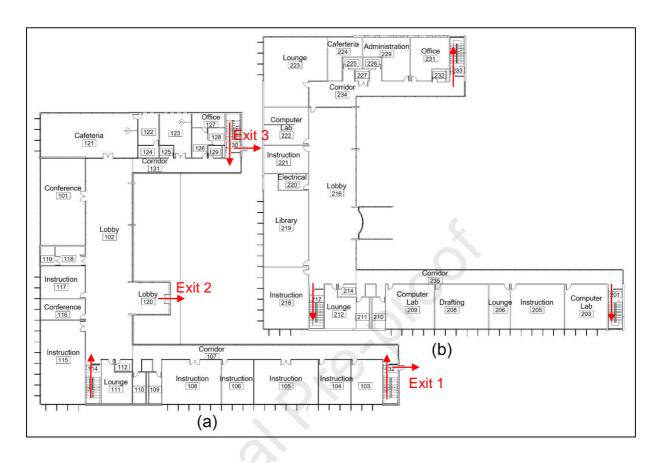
Floor plan of the building (a): First Floor, (b): Second Floor
